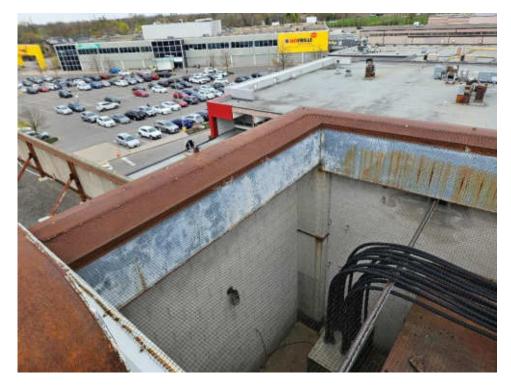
Example of Corroded Cap Flashing (Mechanical Area)
